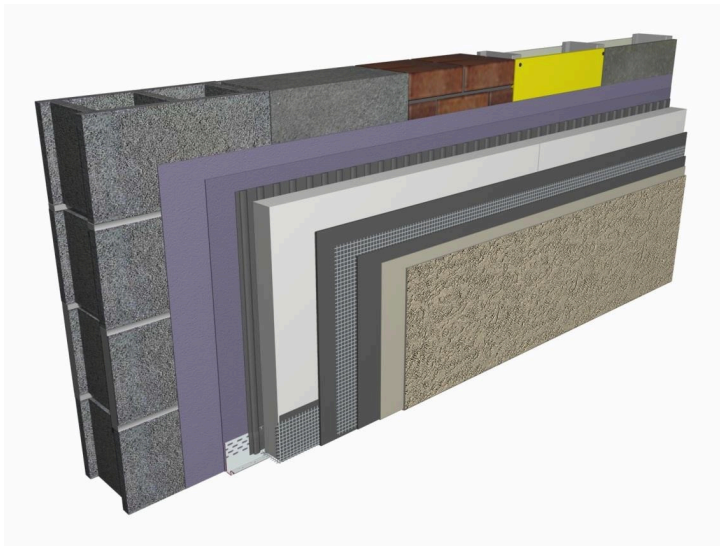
InsulROCK EIFS with Roller Bear and Prep Coat (or Prep Coat D) over masonry, concrete, brick, glass-fibre faced-gypsum board and cement board
